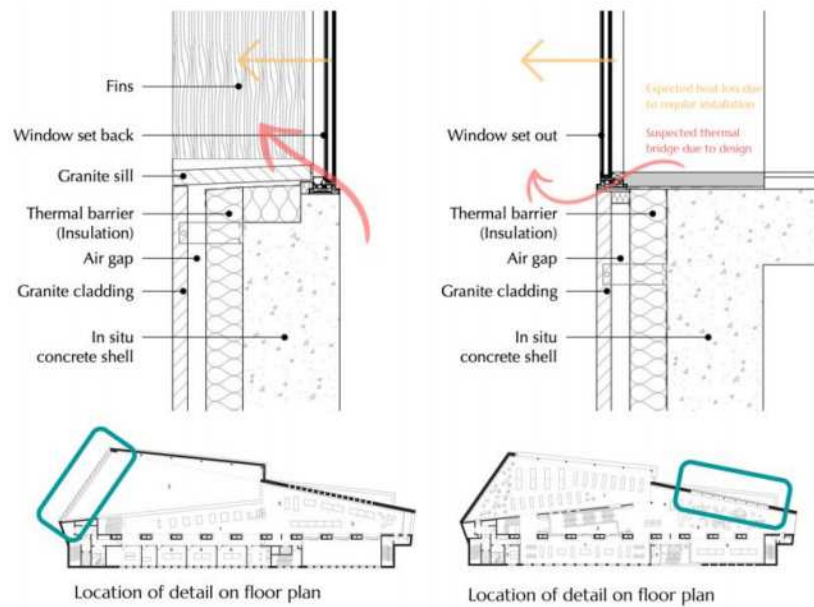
2D detail drawing of wall build-up at granite cladding with window on internal face and location of detail on floor plan.
